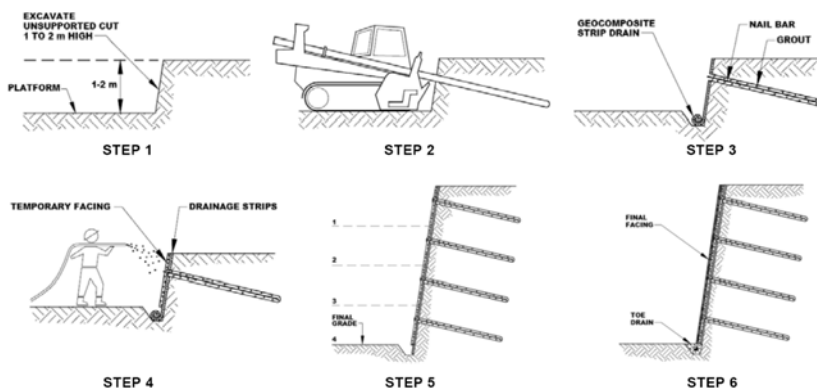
Typical soil nailed wall installation steps: (1) first level cut, (2) drill nail hole, (3) install nail, (4) place temporary facing, (5) construction of subsequent levels, and (6) installation of final facing and toe drain (modified from [2]).
